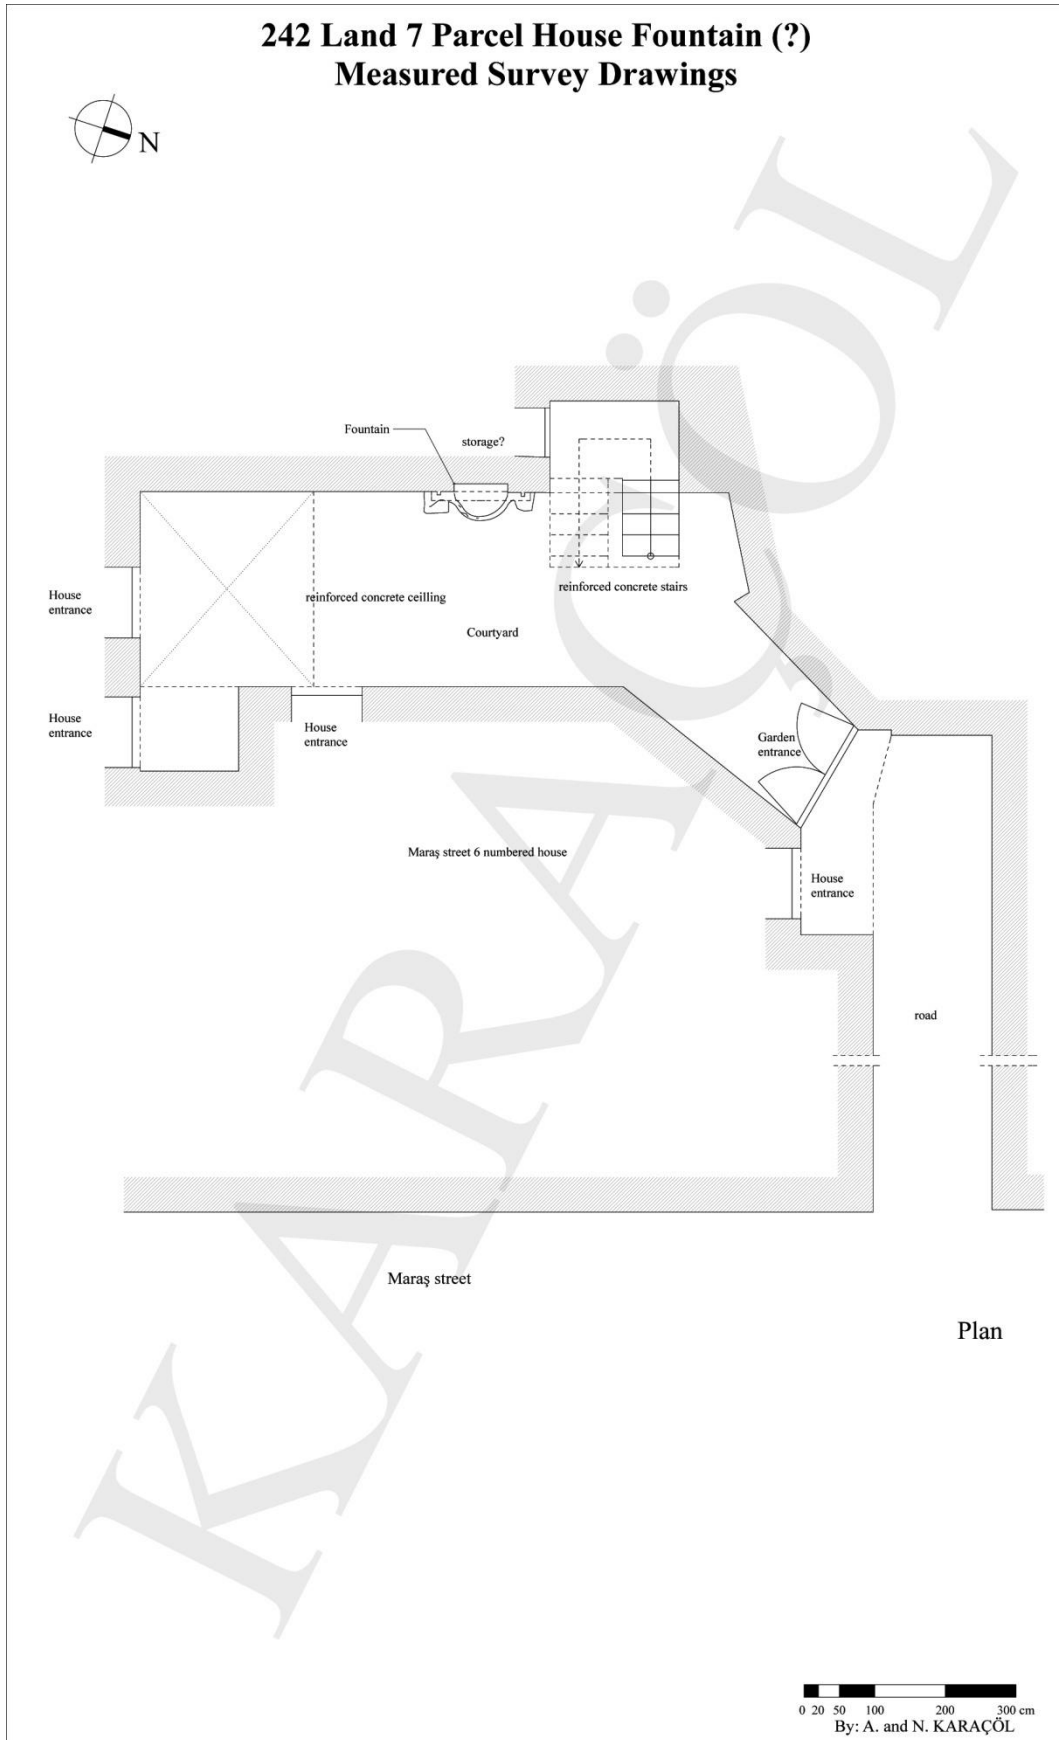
242 land 7 parcel house fountain plan drawing
